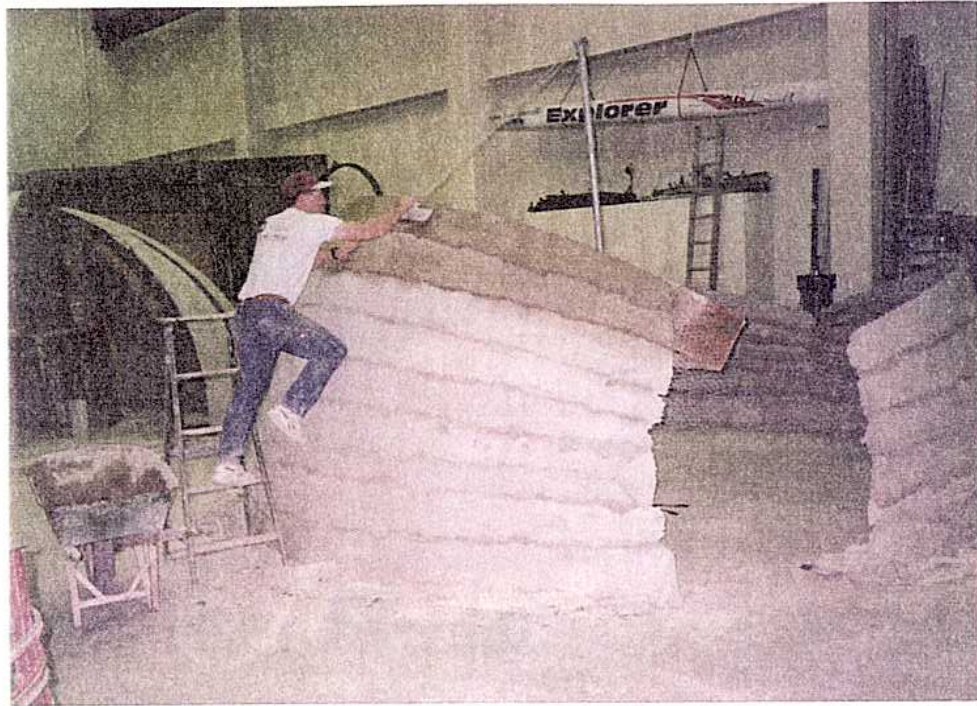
As the dome grows, it is necessary to leave the form in place longer to cure better.
